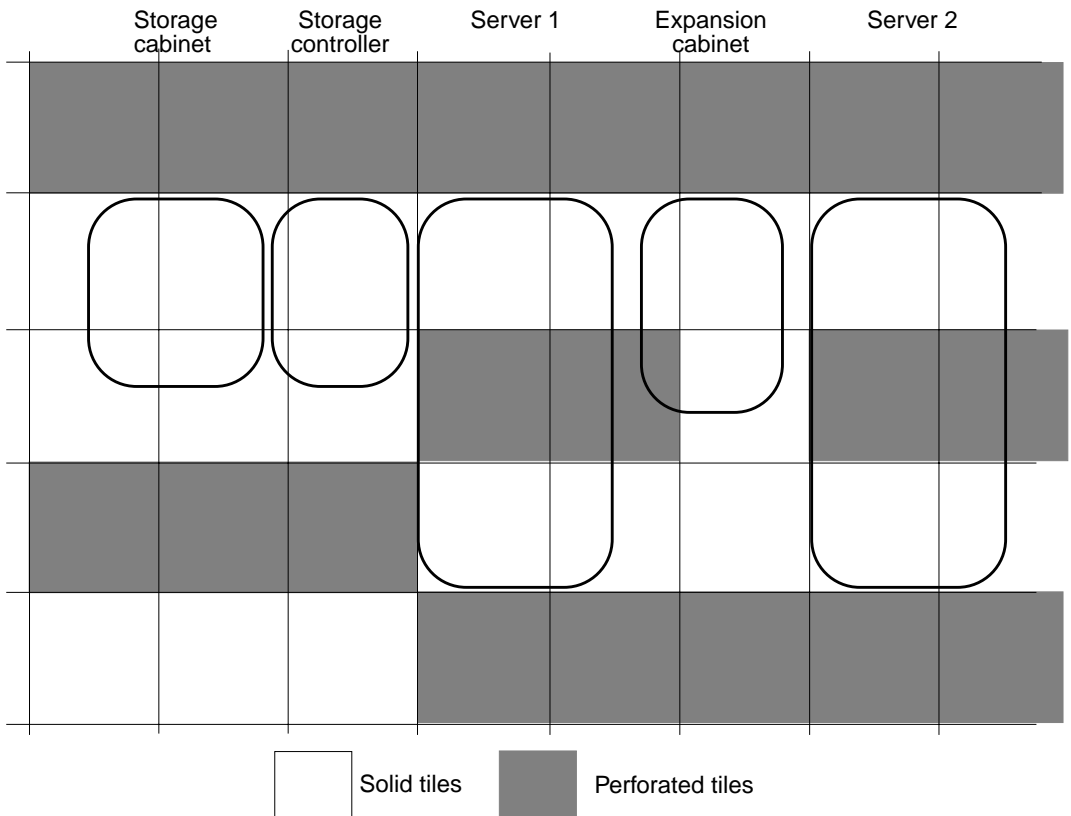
Solid and Perforated Tile Floor Plan
